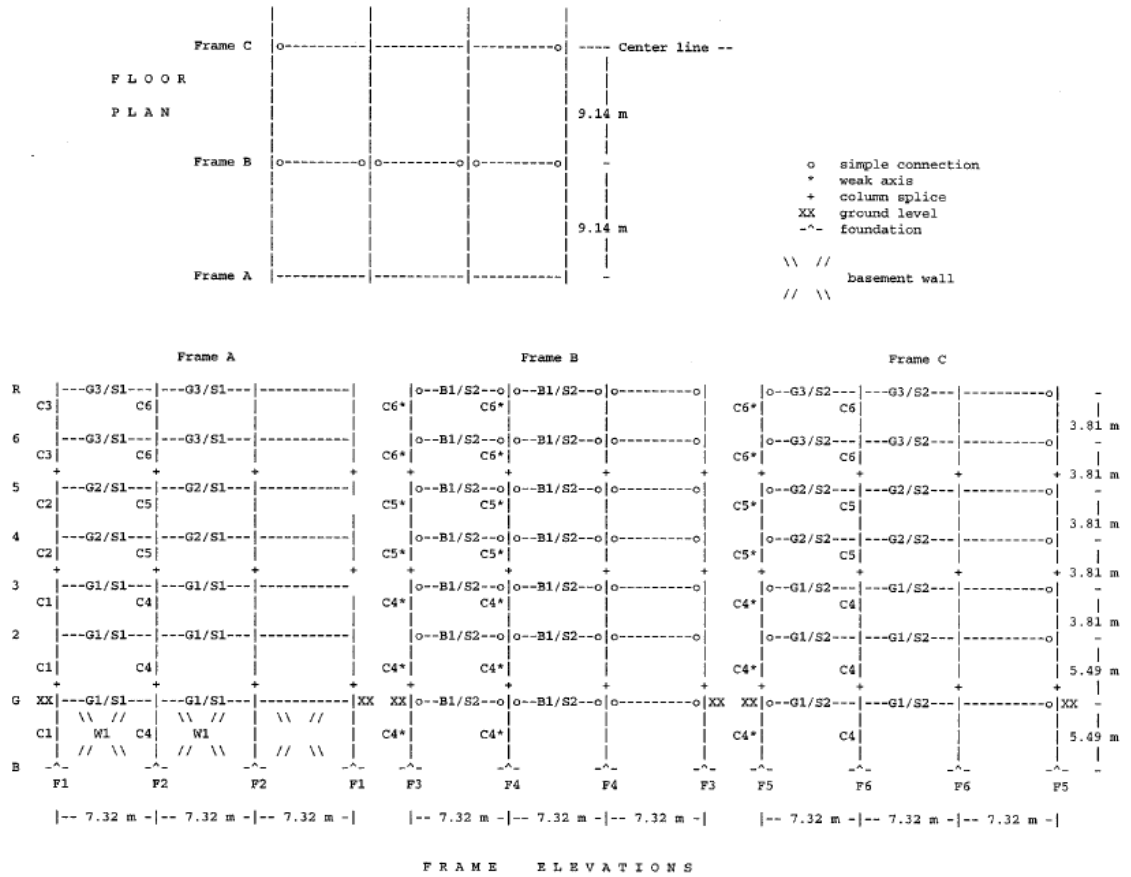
Floor plan and frame elevations of the 6-story building designed according to the Japanese building code (J6) (Hall, 1997).
